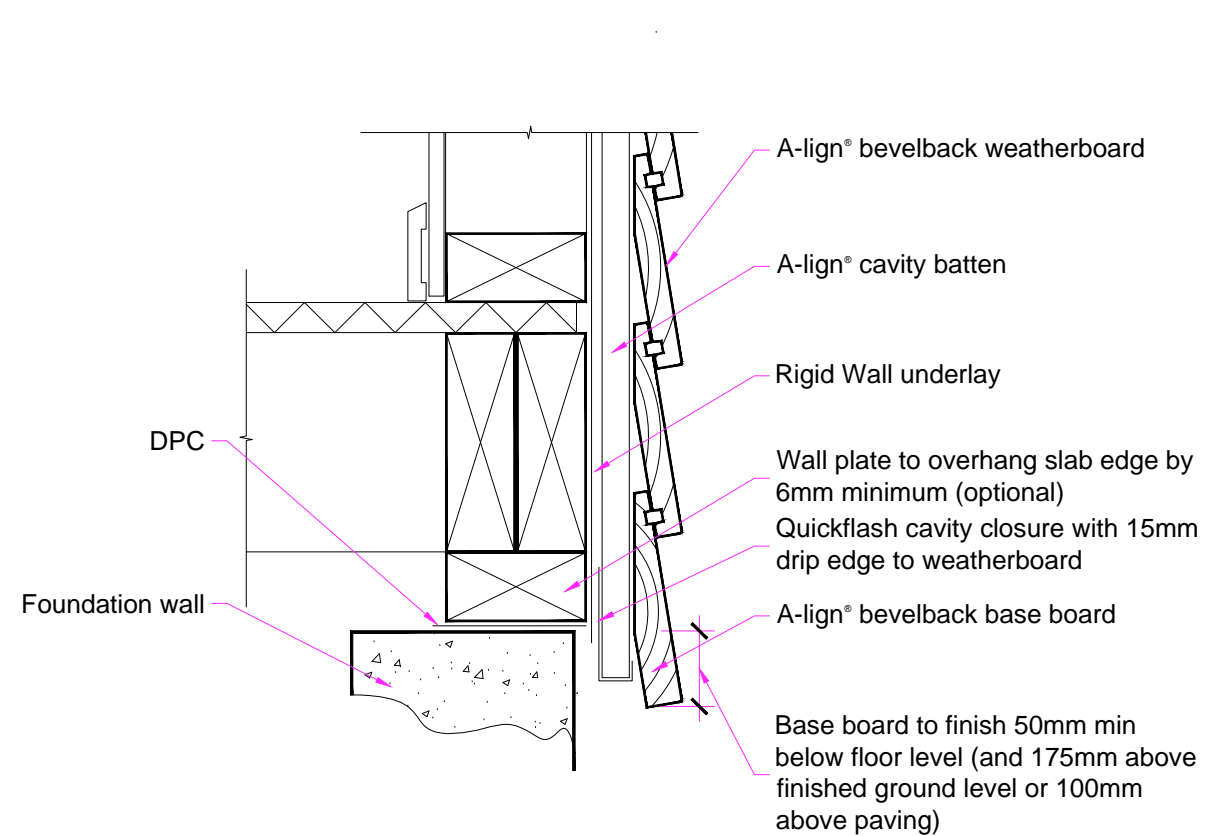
A-lign® bevelback weatherboard - cavity - base of wall - timber floor
